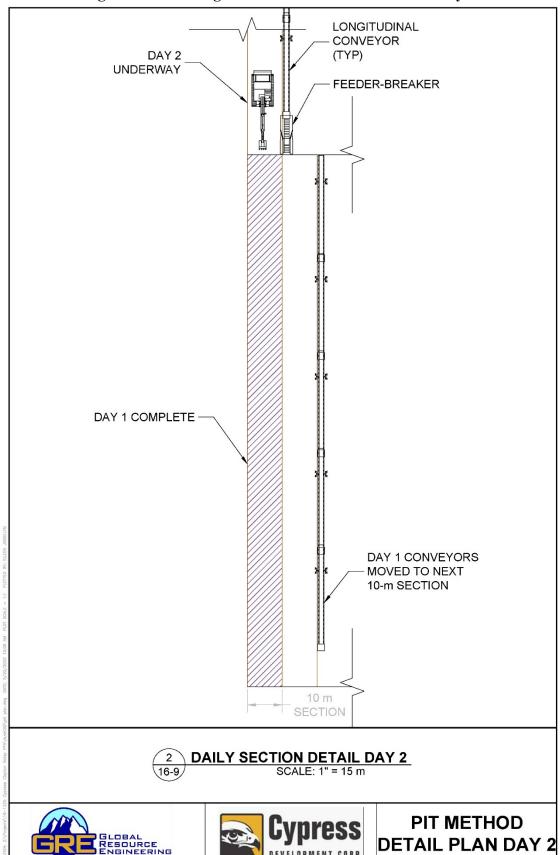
Mining Method Schematic Plan Detail Day 2
